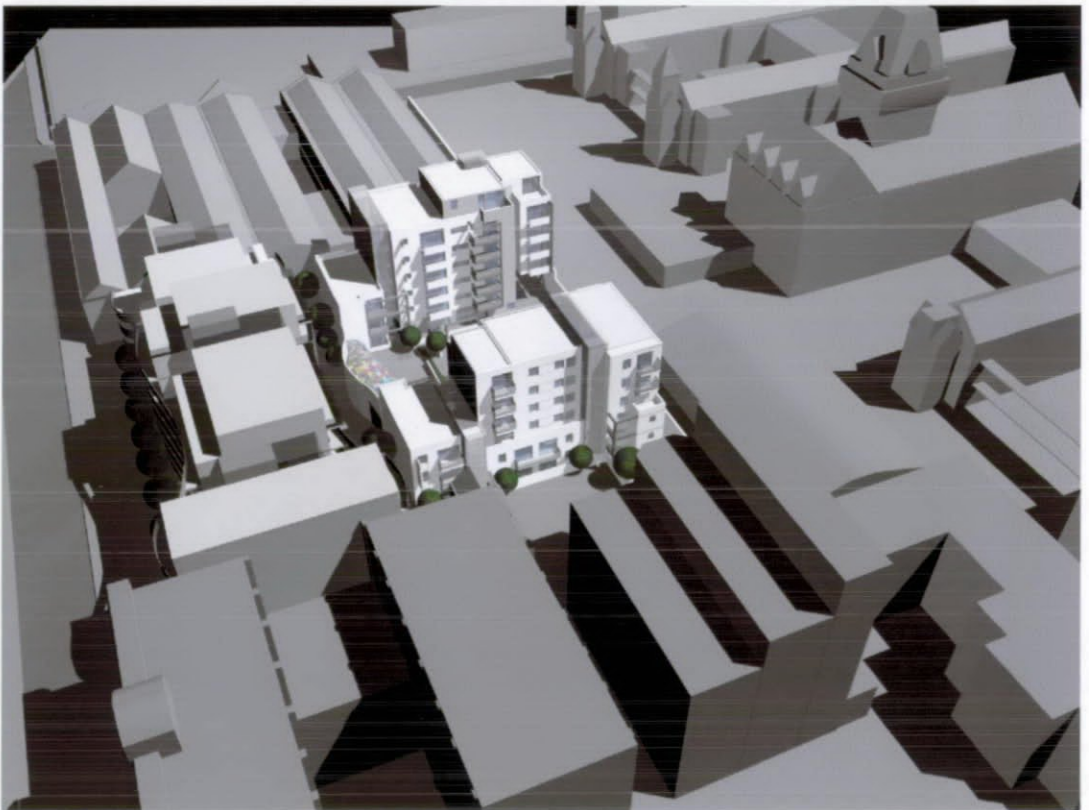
SITE MASSING MODEL - VIEW FROM WEST
